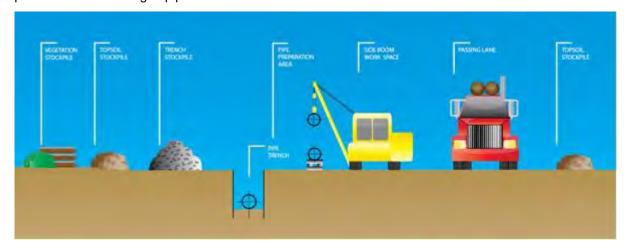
Indicative Gas pipeline right of way construction cross section
